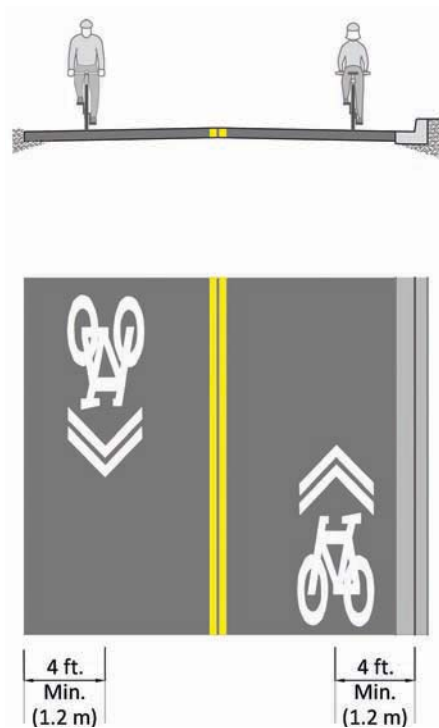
Typical Shared-Lane Marking Cross Section on Street with No On-Street Parking
